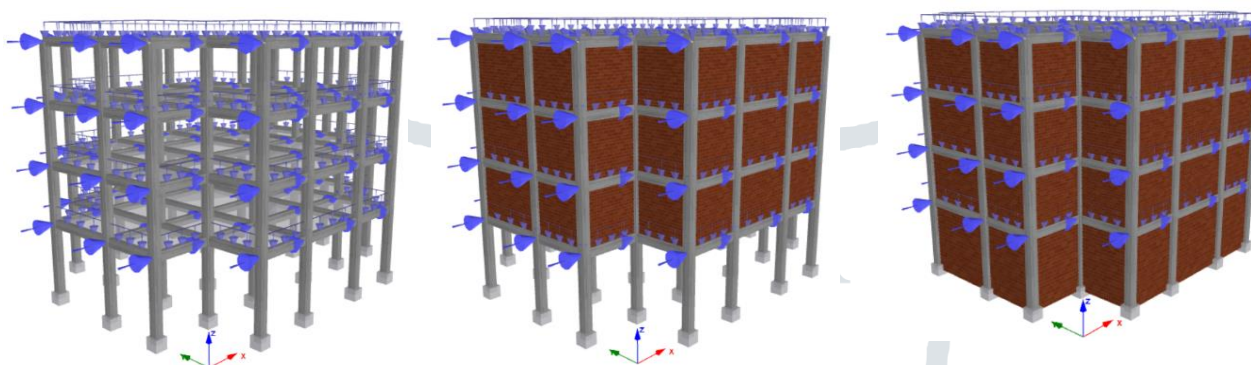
3D models (a) bare frame (b) open ground storey (c) full infill frame
